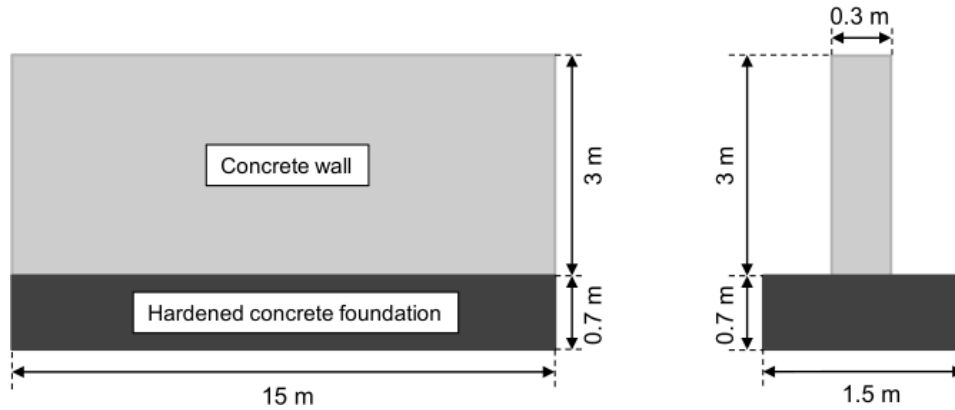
Layout of the hypothetical case study for a wall cast on rigid foundation.
